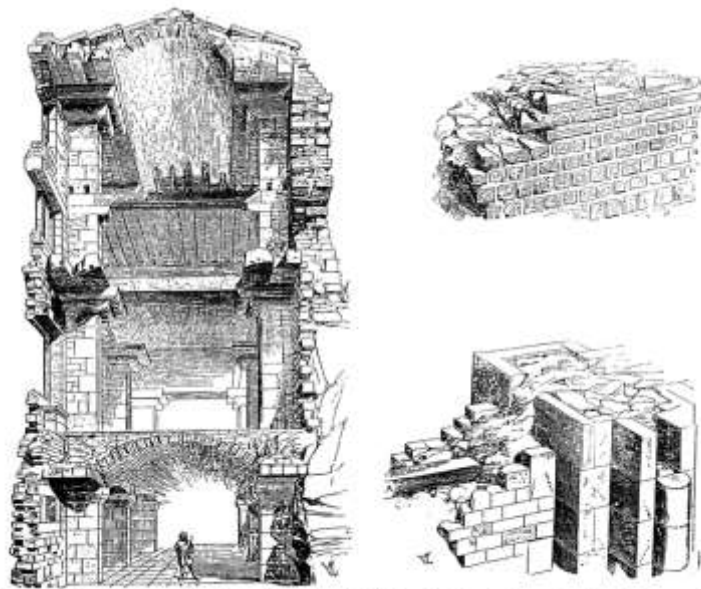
Constructive section through a medieval building. Details of the construction of roman and medieval walls (Violet-le-Duc 1858)
